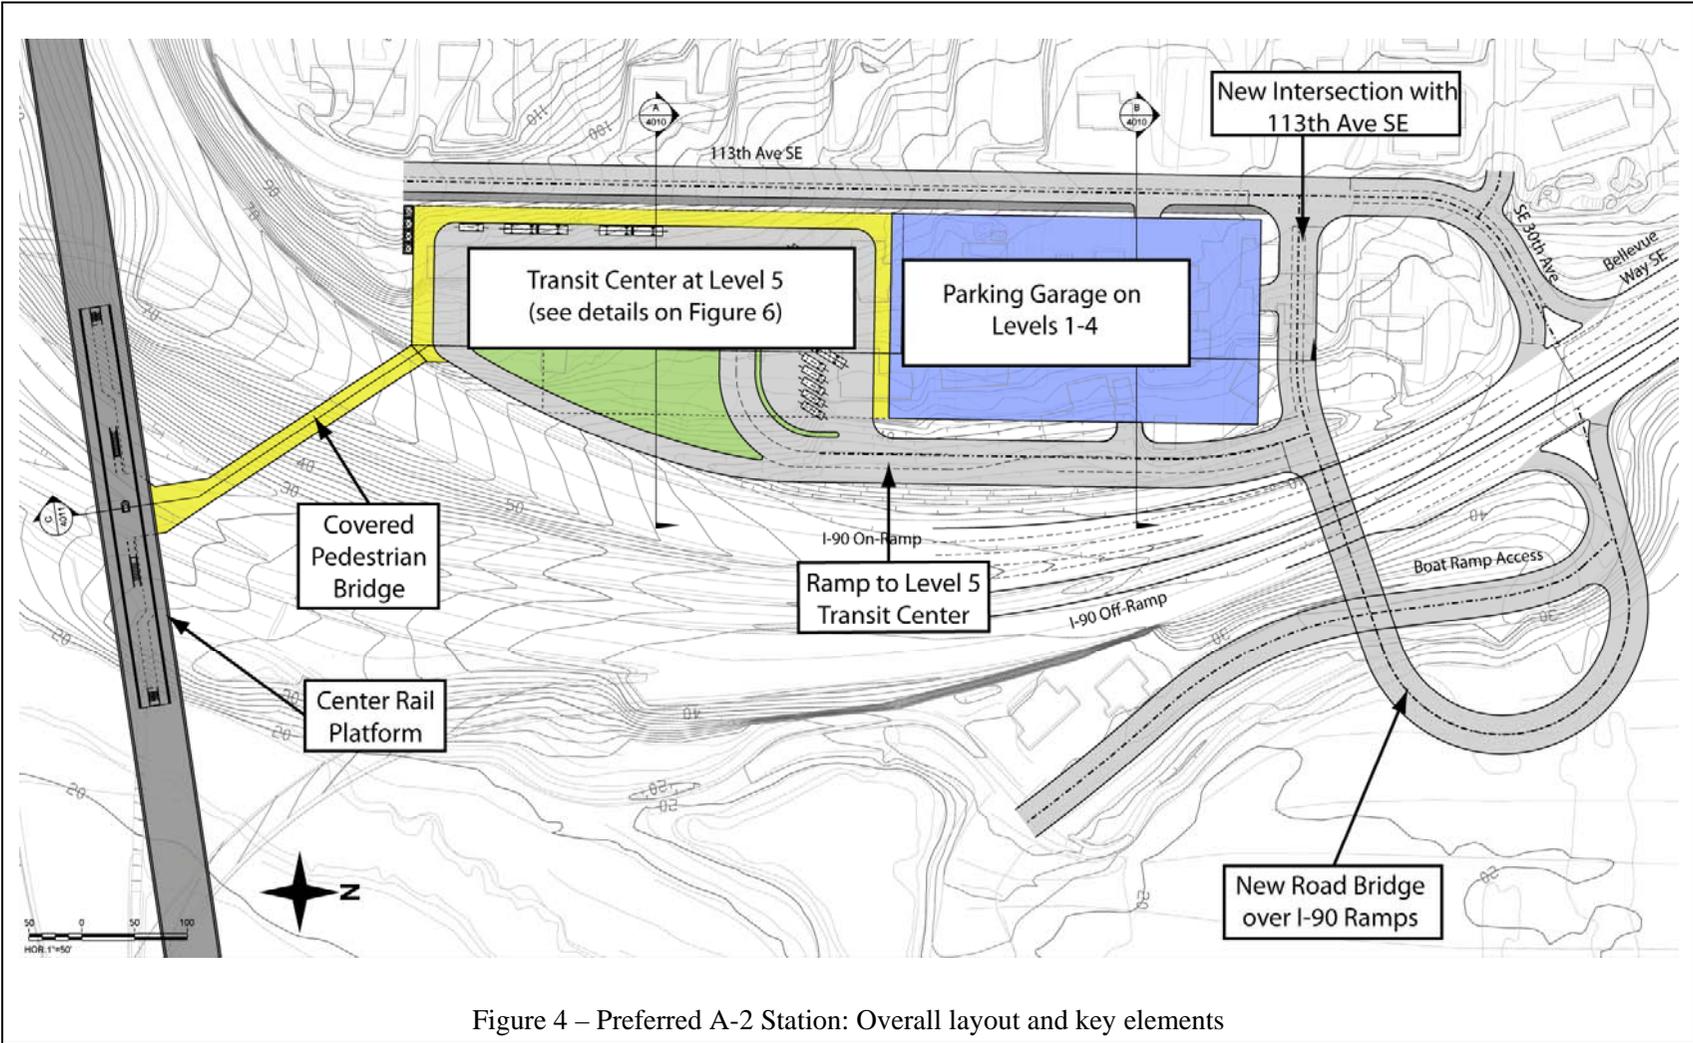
Preferred A-2 Station: Overall layout and key elements
